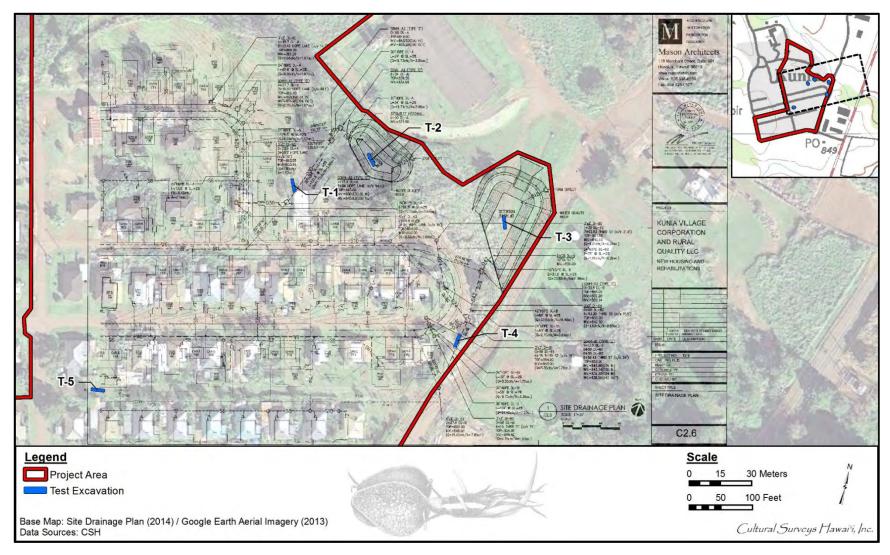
2013 aerial photograph (2013) with an overlay of the site drainage plan showing the locations of T-1 through T-5
